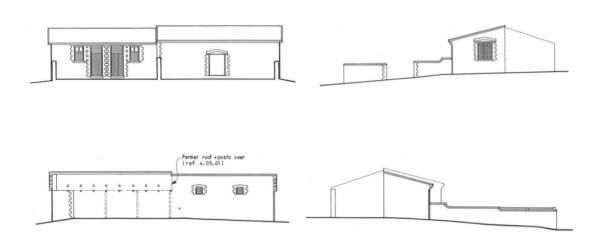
Elevations of existing Stables from LeMessurier Architect's CMP 1991.
